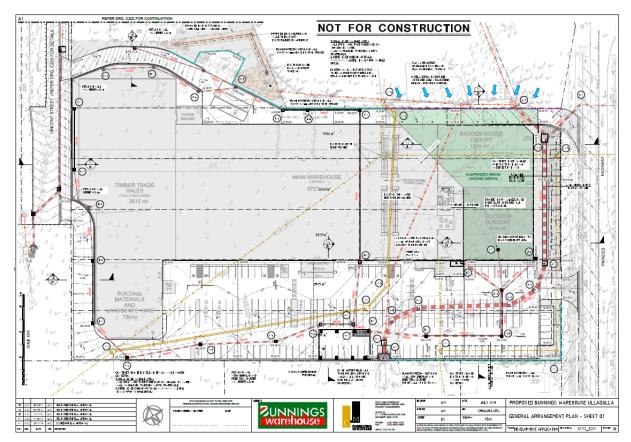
Civil layout plan detailing water, sewer and stormwater infrastructure proposed for the development. Note – yellow line = sewer, red dashed line = stormwater & blue lines = water supply. Light green shading indicates a suspended slab designed to allow overland stormwater to flow beneath the building.
